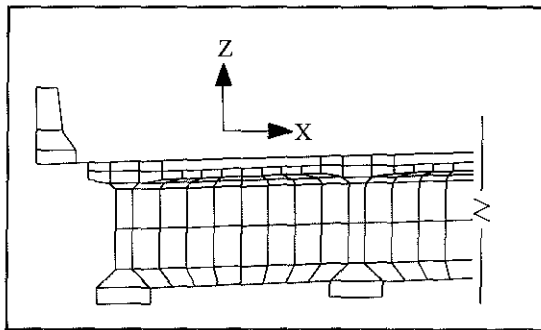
Cross Section of the Southbound Bridge Finite Element Model.
